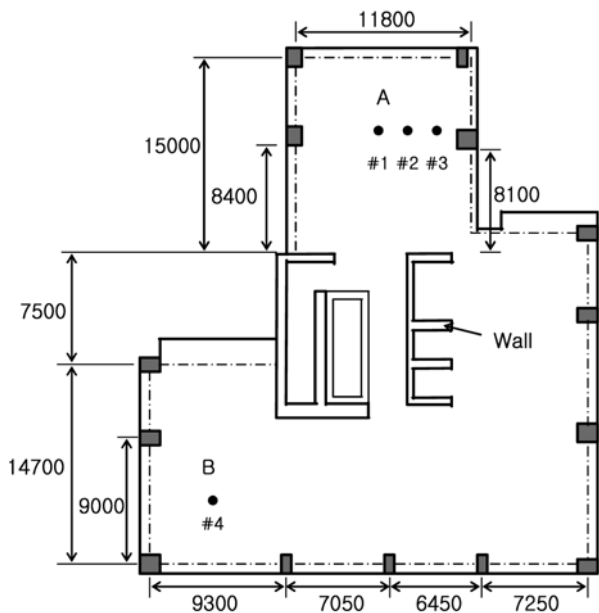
Floor plans of S-building for construction load measurement (unit: mm)
